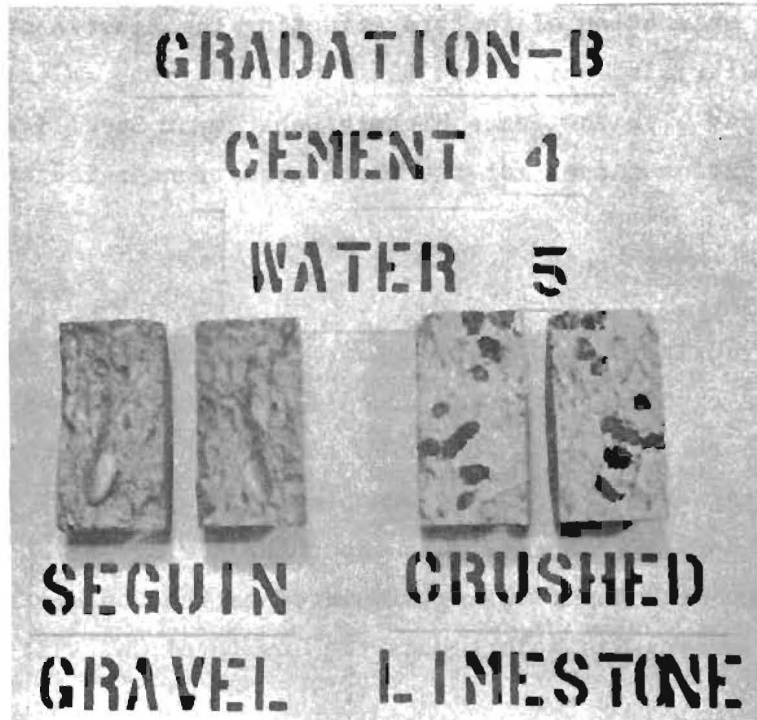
Typical failures of crushed limestone and rounded gravel specimens.
